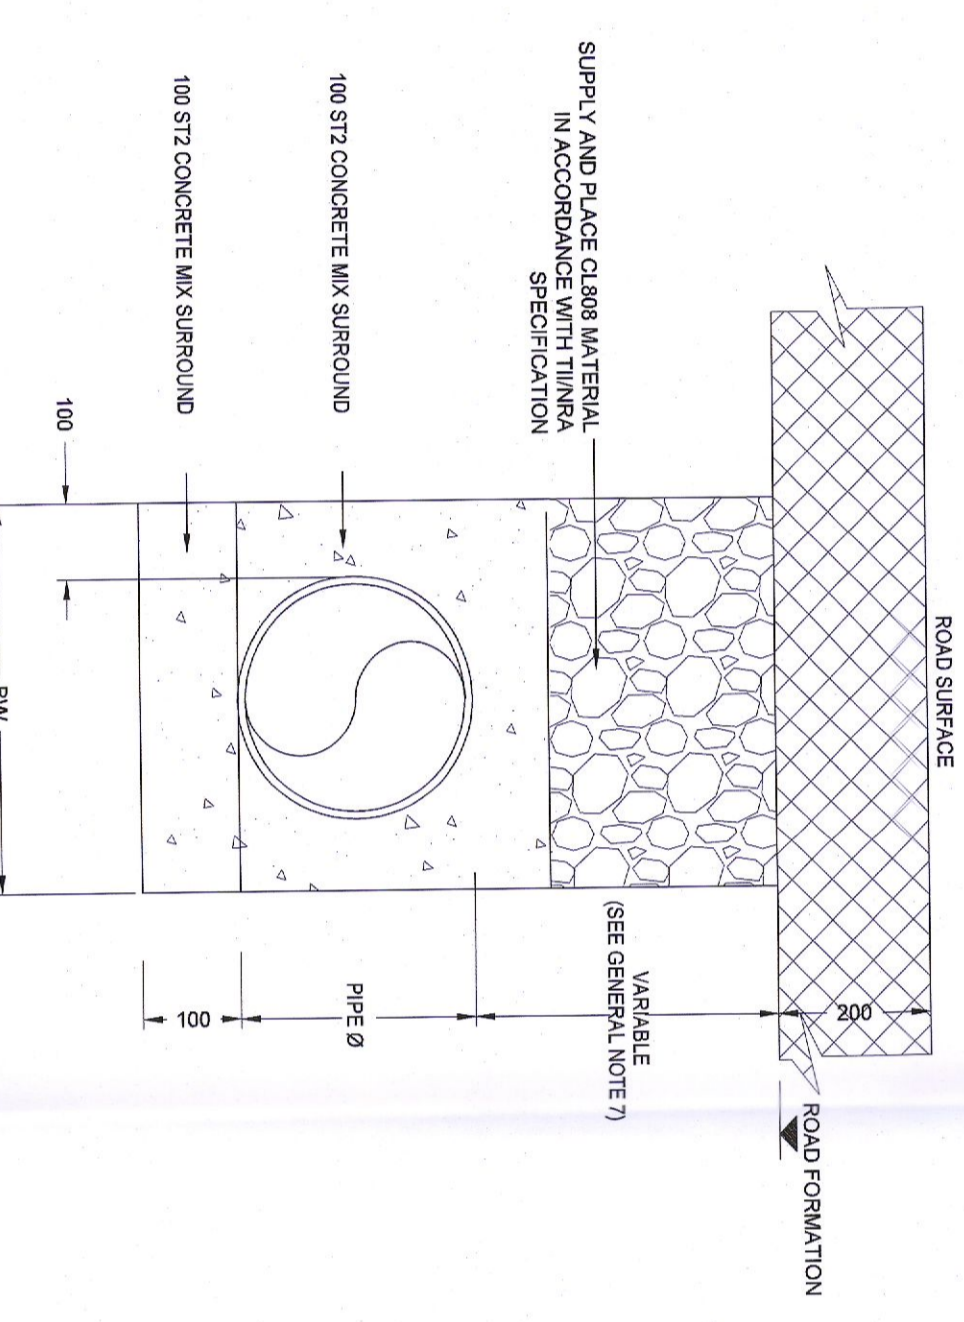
FOUL AND SURFACE WATER UNDER ROADWAY
